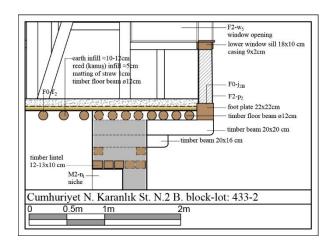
Connection detail 2, section drawings of floor beams on the wall plate of masonry wall and timber framed wall of upper floor located on the foot plate in case of existence of projection (Cumhuriyet N. b. block-lot: 432-2)
